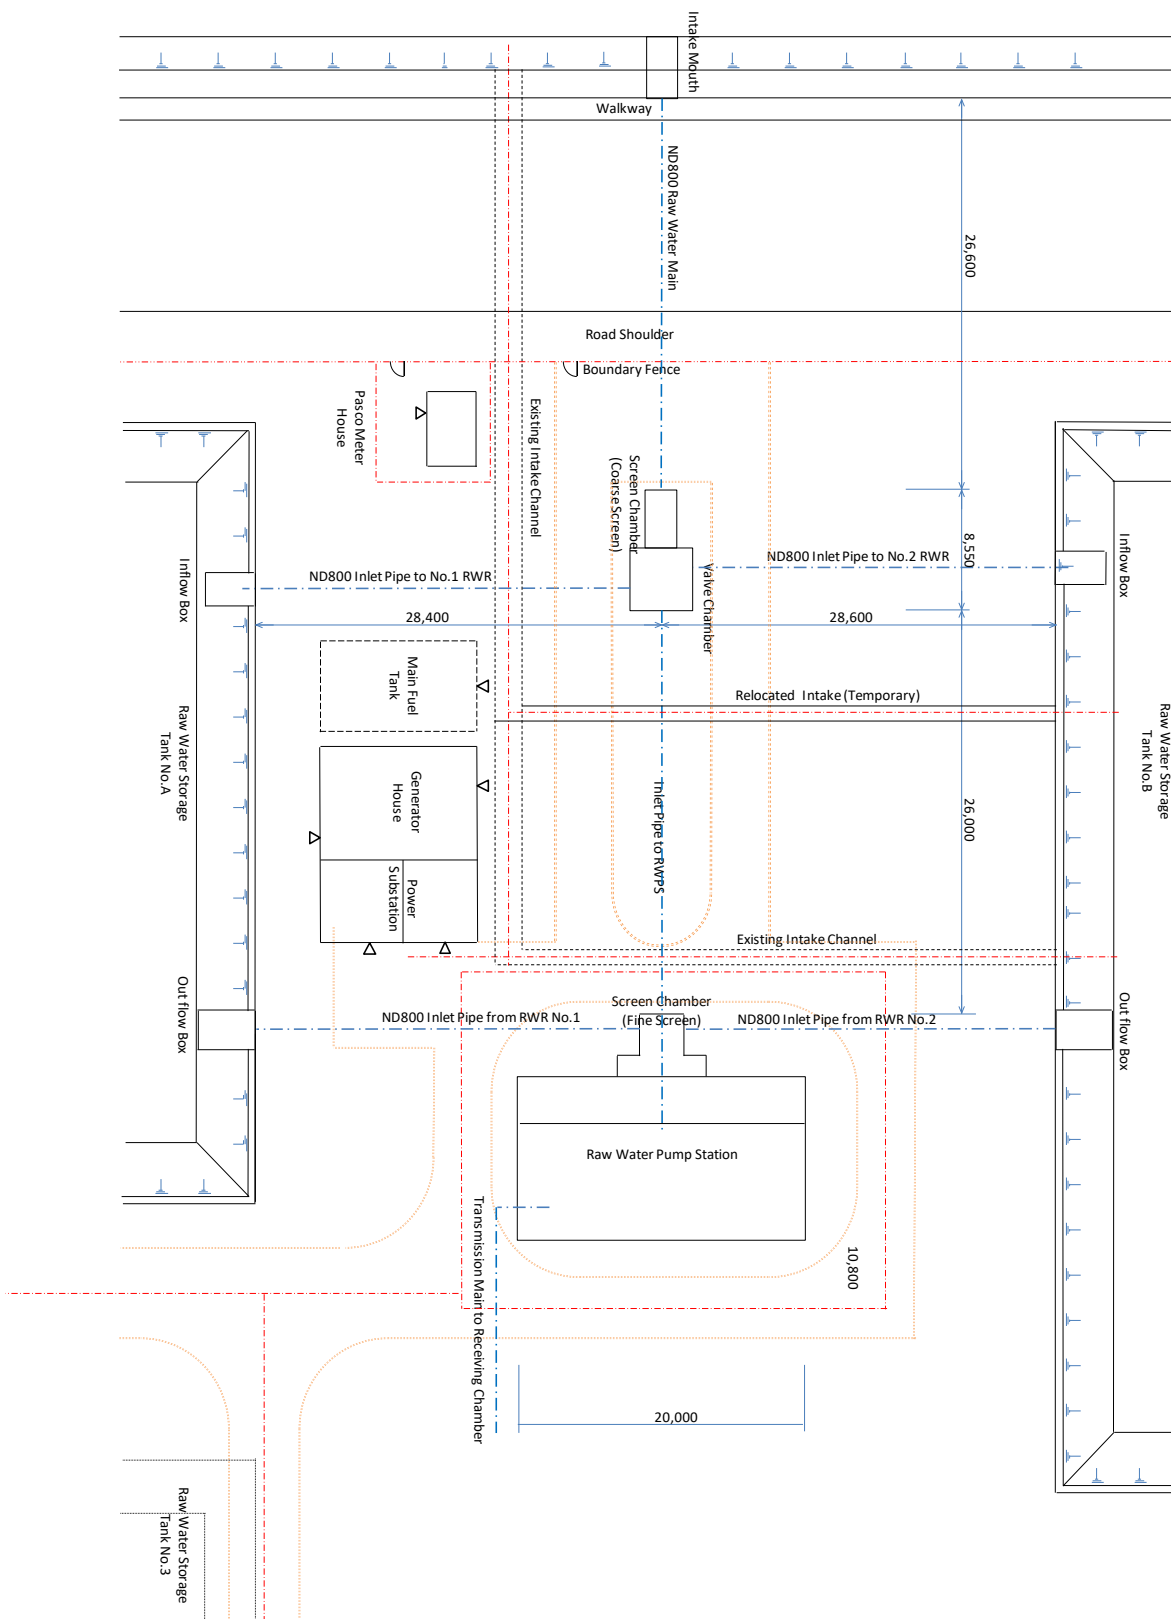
Plan of Intake and Raw Water Transmission Facilities
